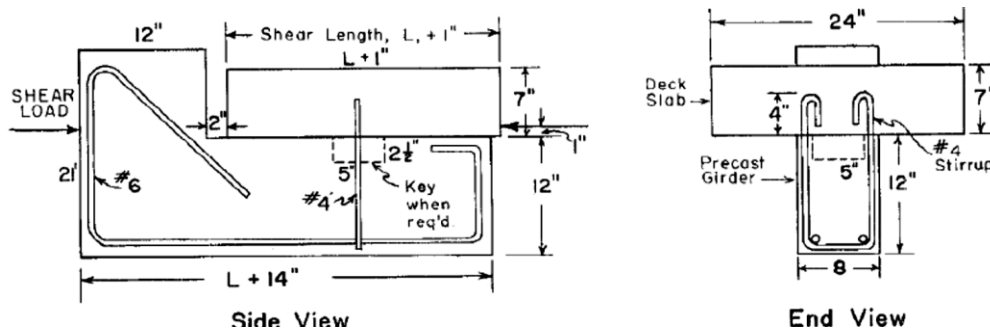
Typical push-off specimen (Hanson, 1960)
